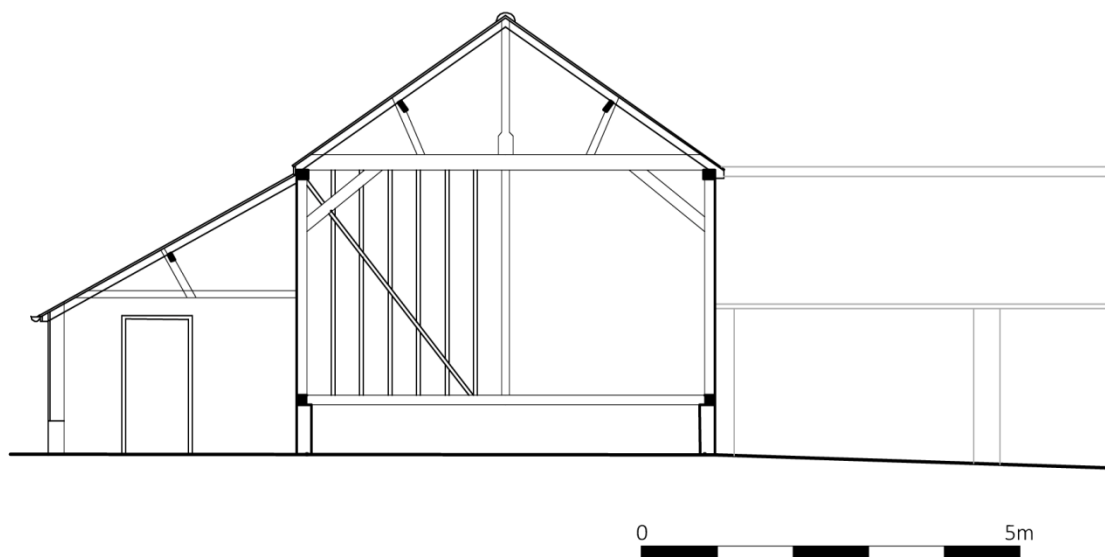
Section showing internal timber work, facing north (scale 1:100)
